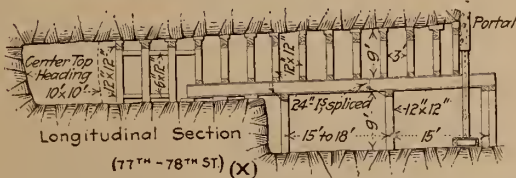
TIMBERING METHOD, SECTION 9 - LEXINGTON AVE. TUNNEL (X & Y)
